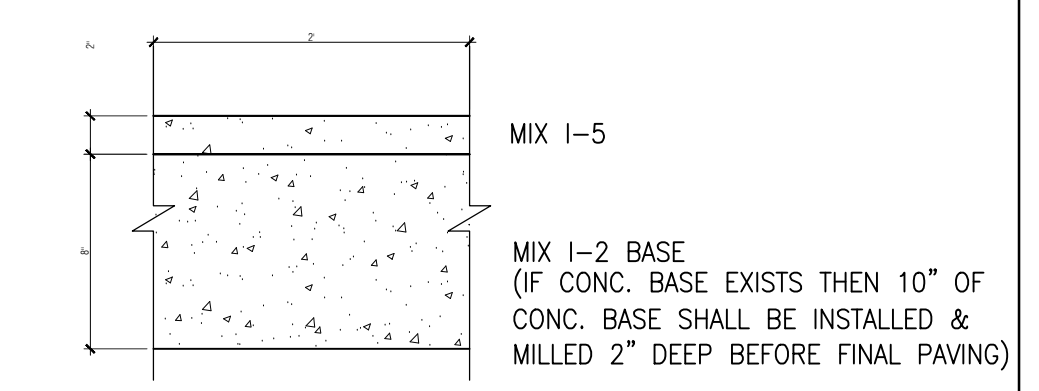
TYPICAL 9' X 20' VERTICAL CONCRETE CURBING/PAVEMENT REPAIR
